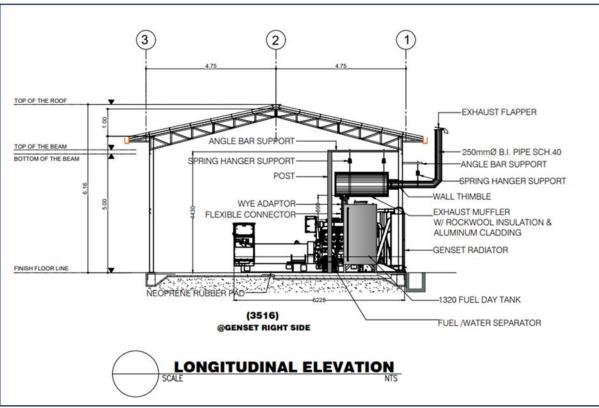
Elevation drawing of the powerhouse and stack of the proposed gensets.
